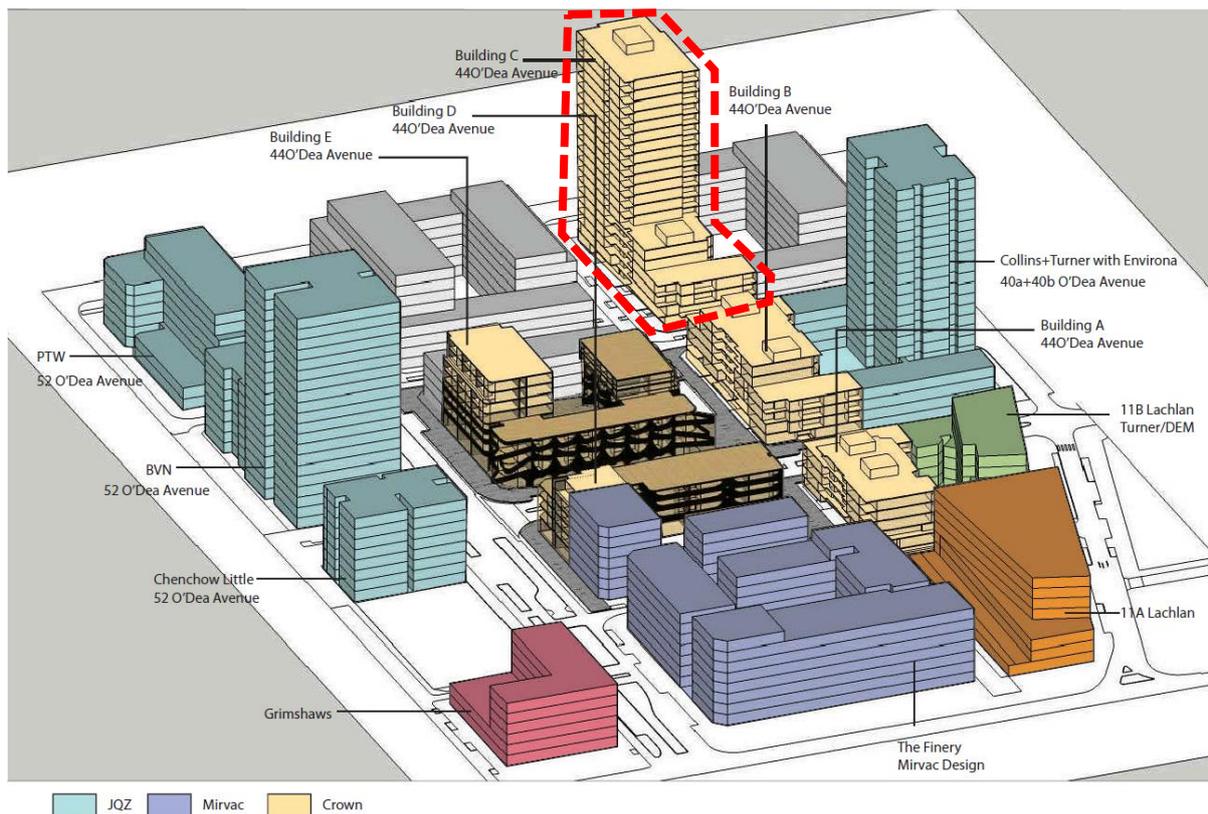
Wider concept plan showing Building C envelope, the four other building envelopes at 44-48 O'Dea Avenue and other key developments within the Lachlan Precinct.
